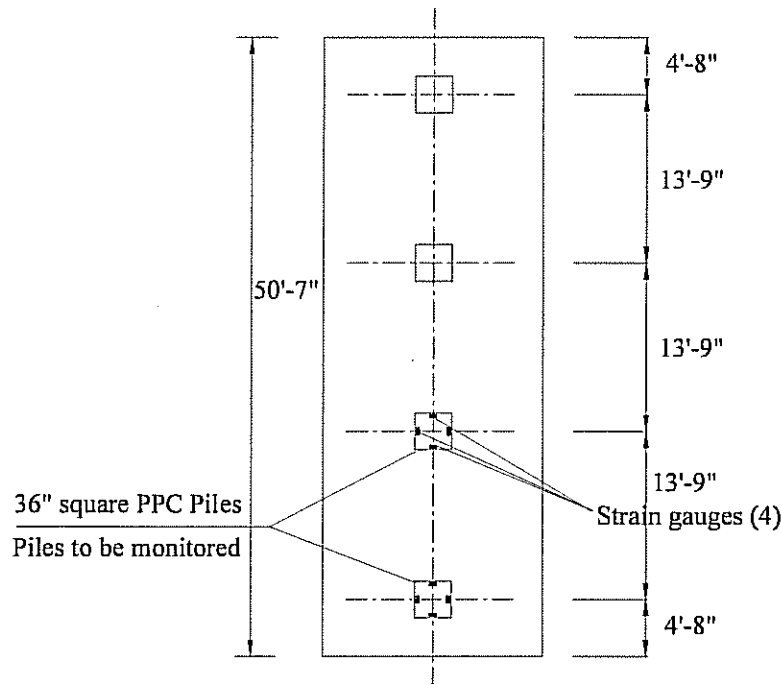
Plan view of piles (Bent 1, LADOTD Design Sheet 109)
